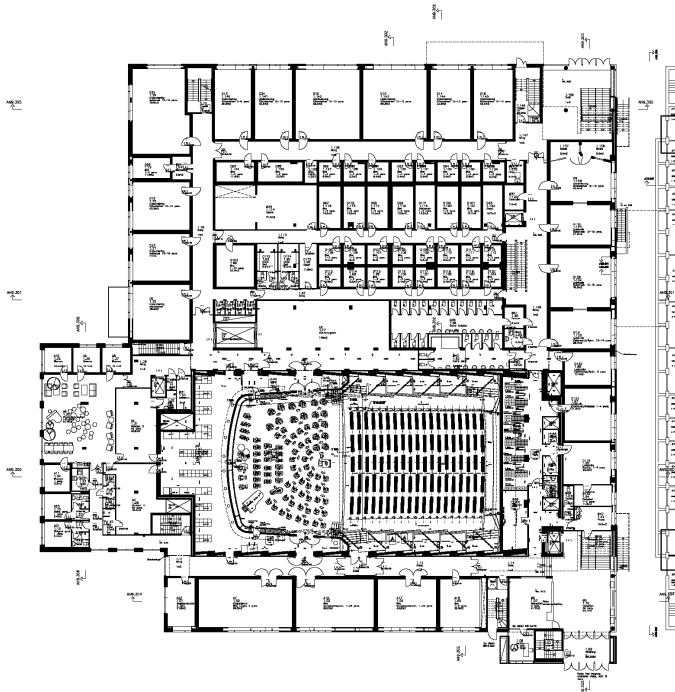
Plan of the ground floor level - Symphonic Hall base level, smaller rehearsal and practice rooms and recording studios
